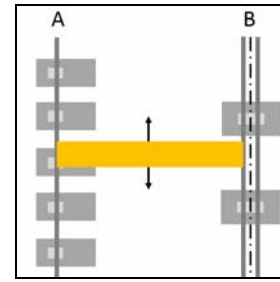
Extract of plan of foundations supporting main construction and crane rail
